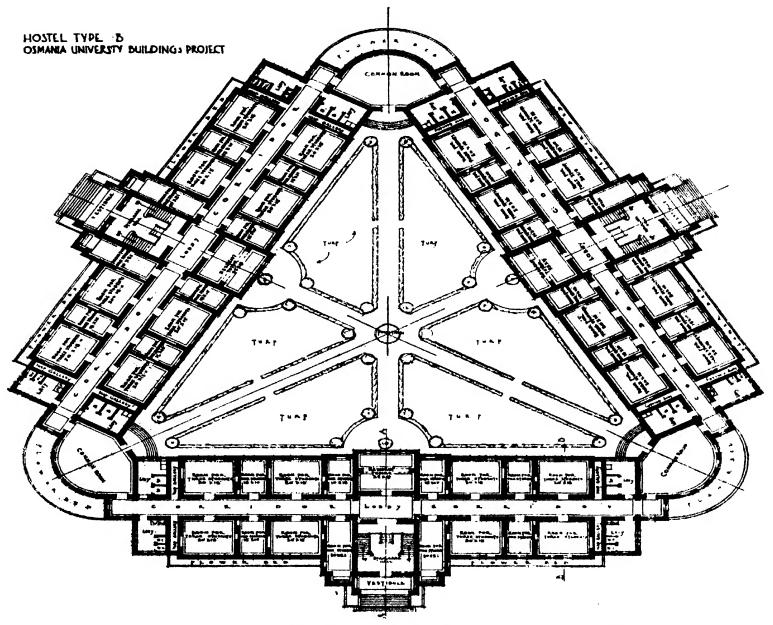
PLATE XXV --- Hostel B for 192 Students --- Ground Floor plan.
